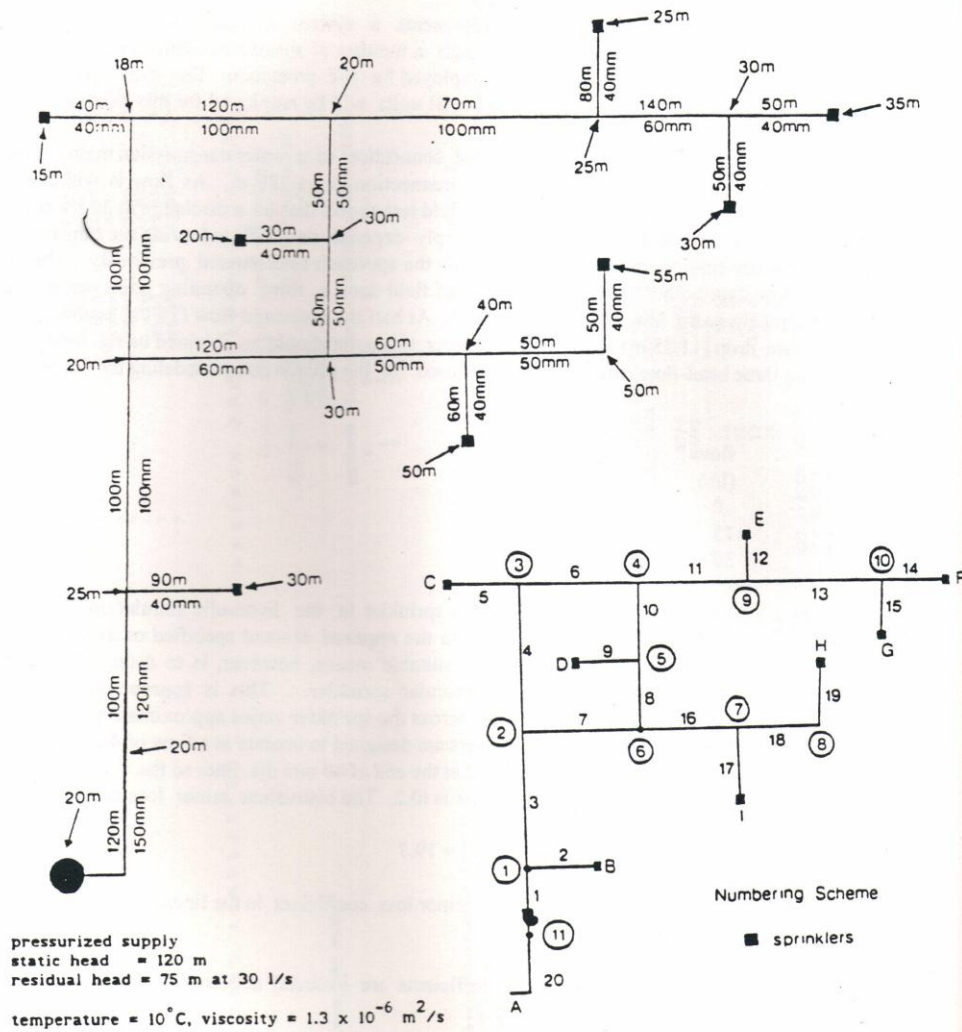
Example 3 - Twenty Pipe Sprinkler System
